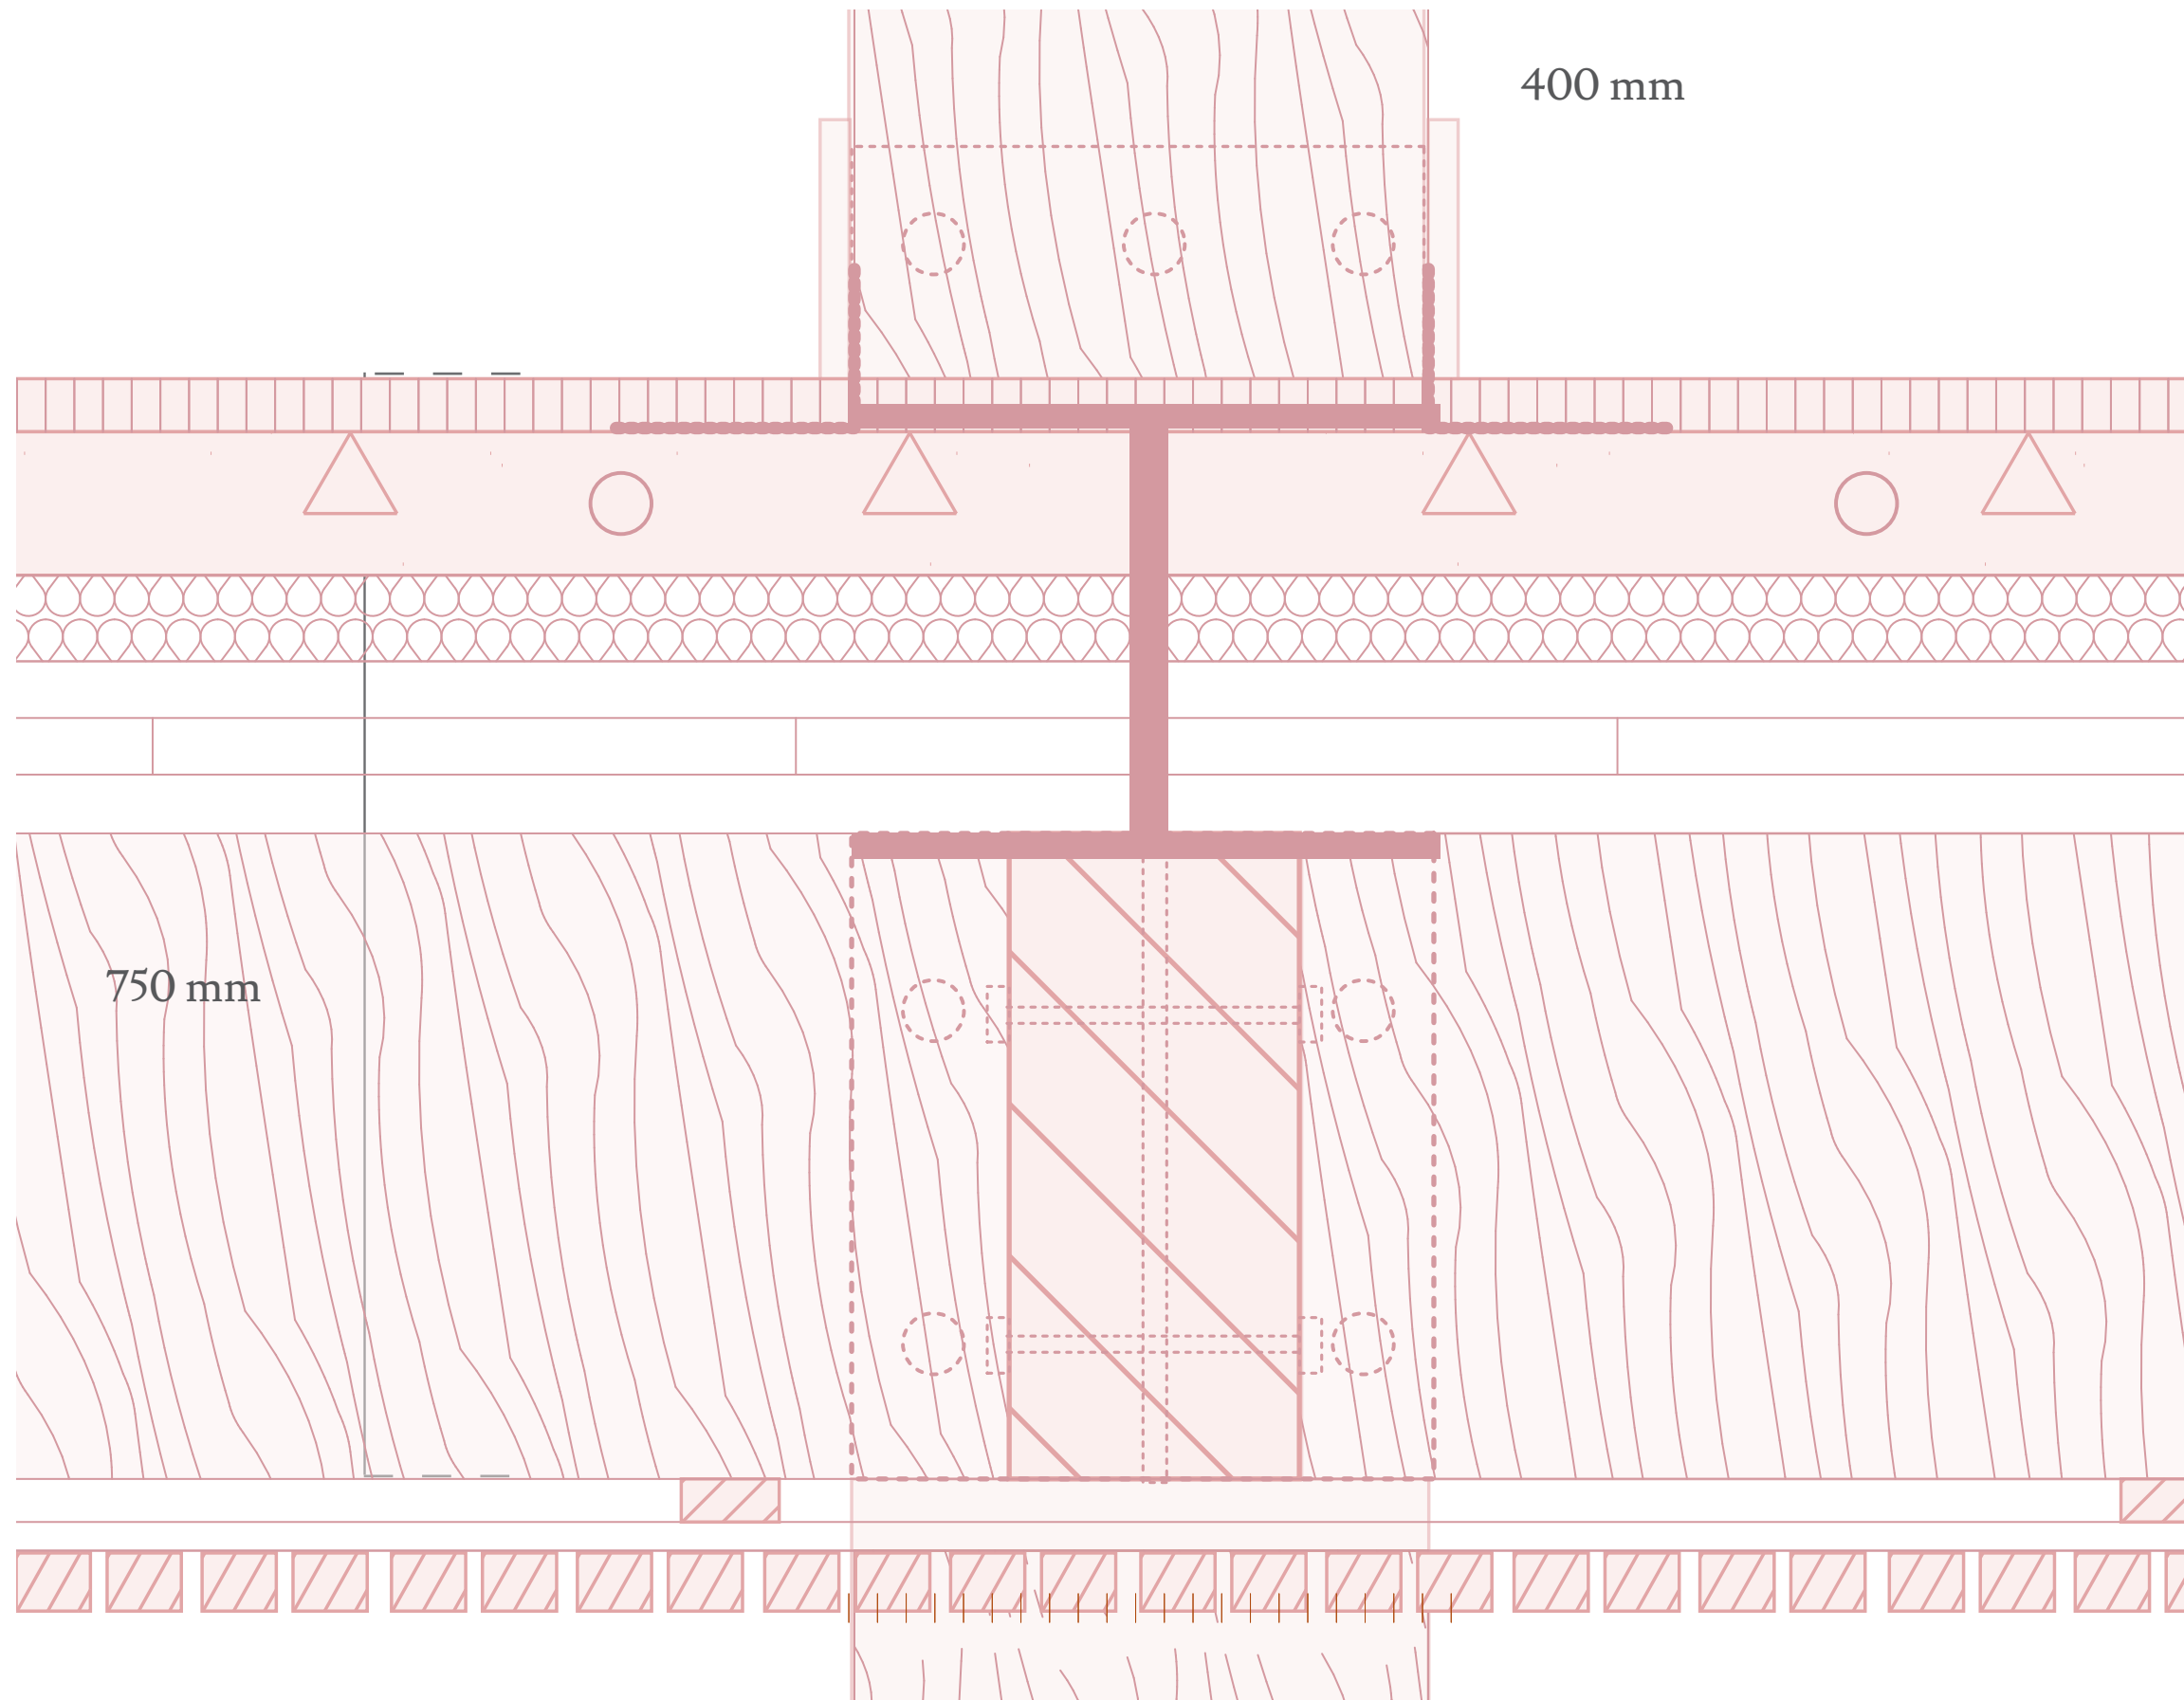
Glulam column-beam-floor connection, scale 1:5
